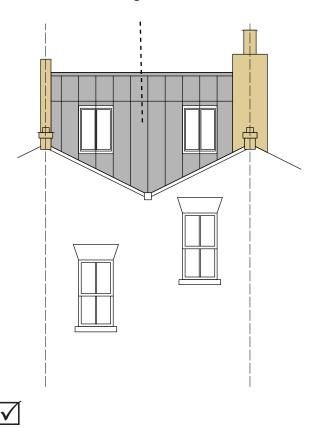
Butterfly form retained with slope of mansard running down to meet the existing eaves
